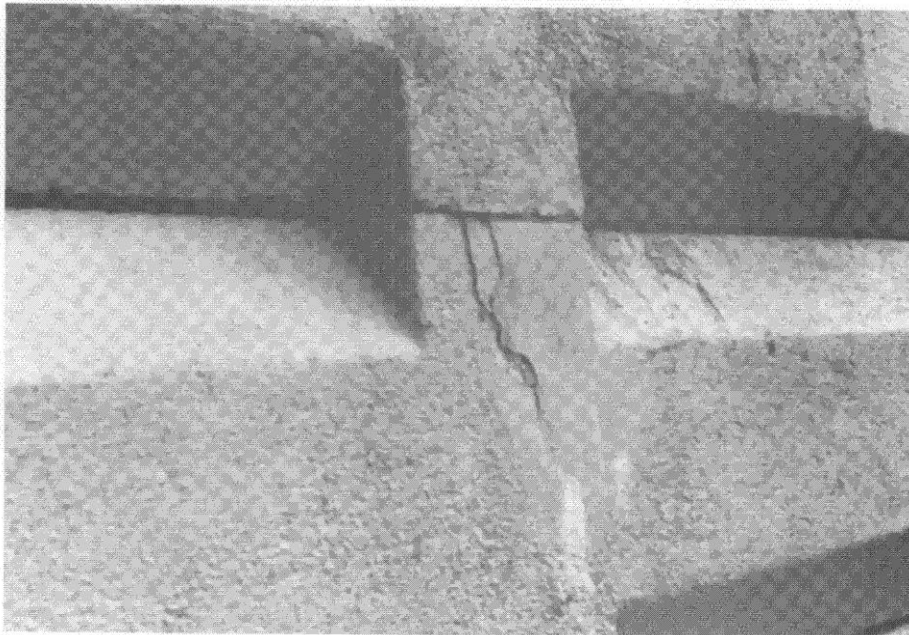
B.--Closeup of Crack in Lower 12 Feet of Wall
